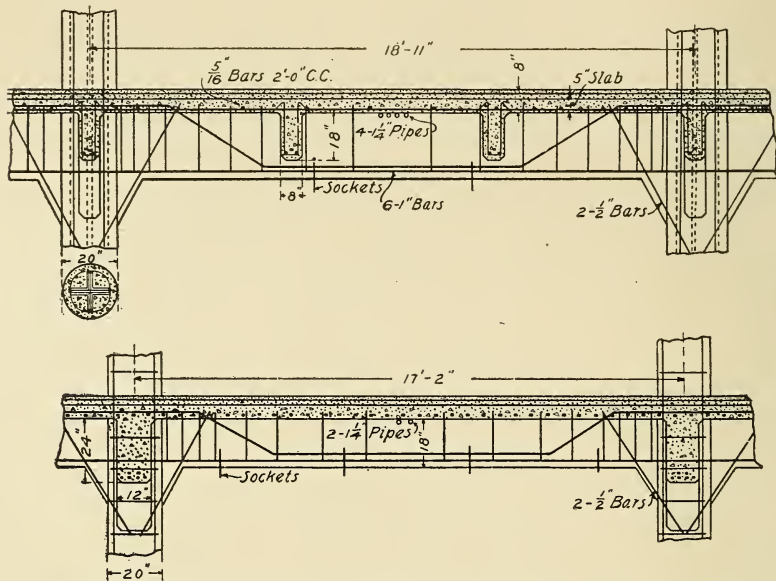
Detail of Beams and Girders for Buck Building, Philadelphia, Pa.
